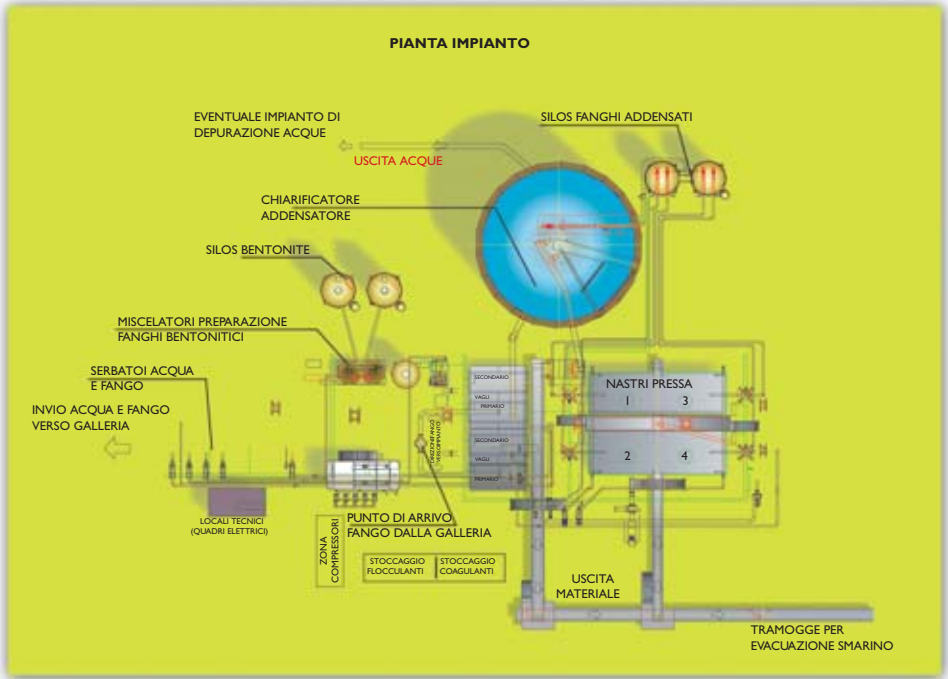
Separation plant layout of the EOLE project (see Section 8.1).
